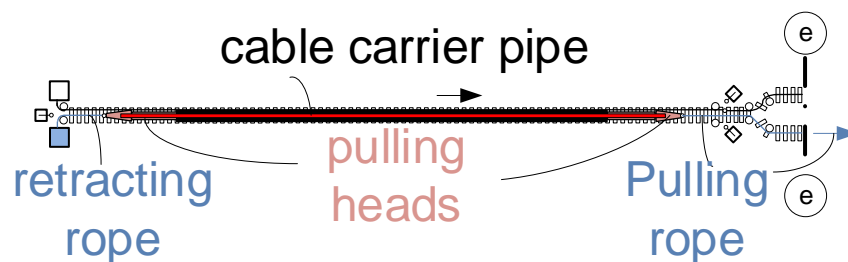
Step 3b – Final airtight closing of the cable carrier-pipe system with removable pulling heads at both ends ©
